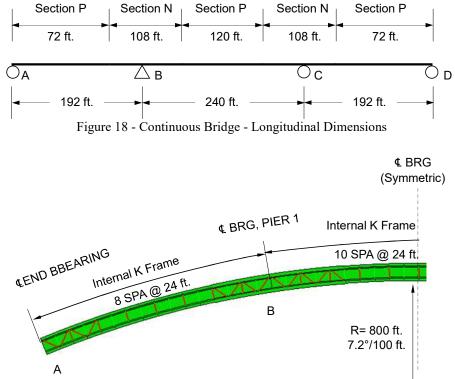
Half of the Symmetric Three-Span Bridge - Plan View
